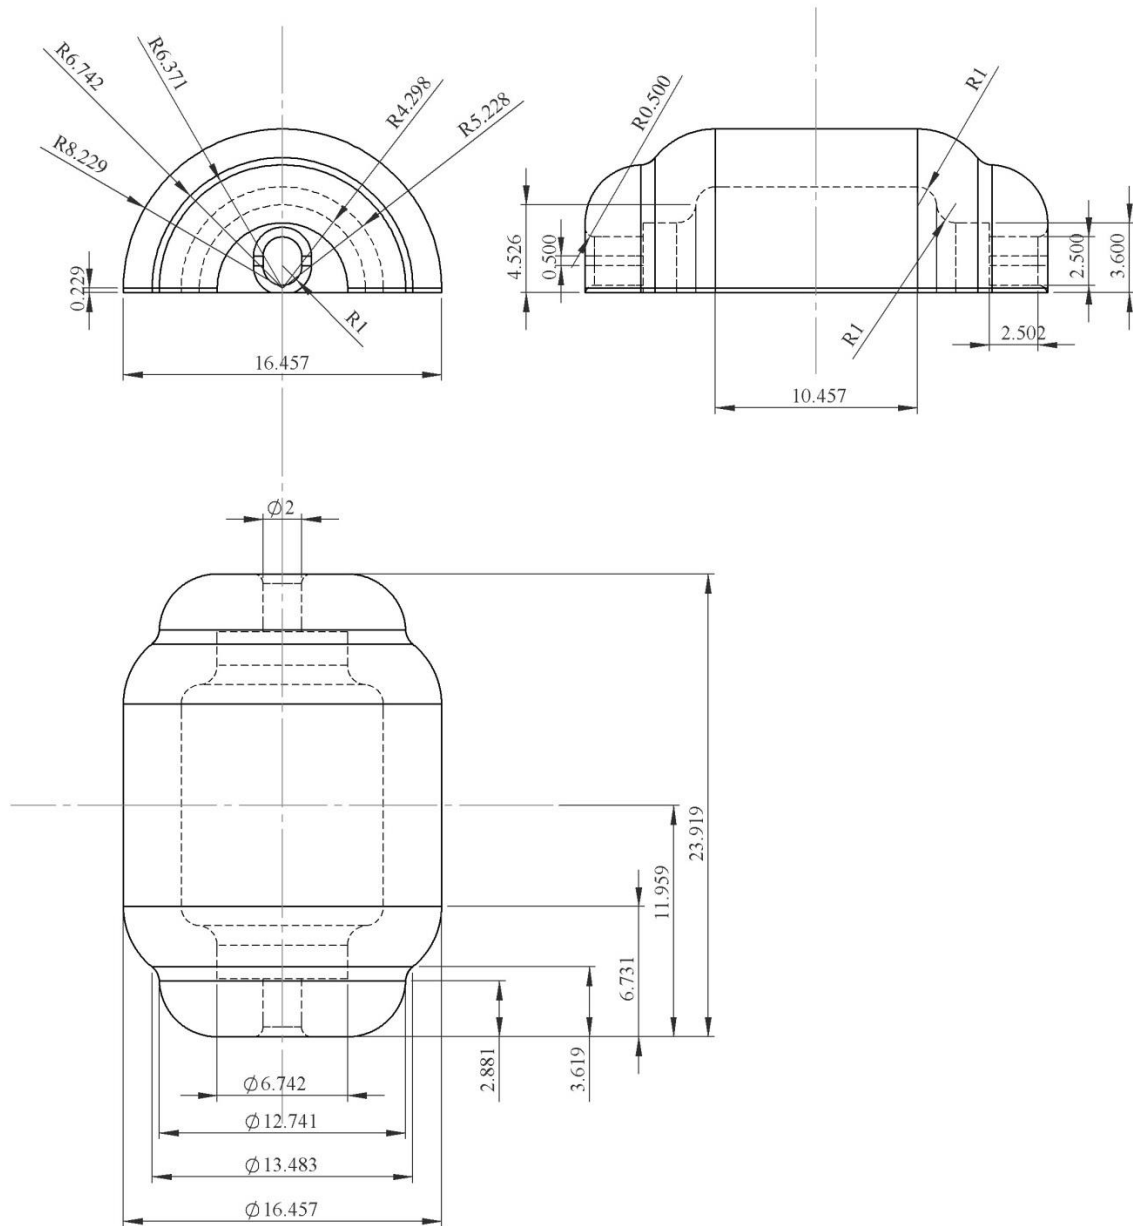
3. Engineering drawing of the regolith shield. All the dimensions are in meters.
